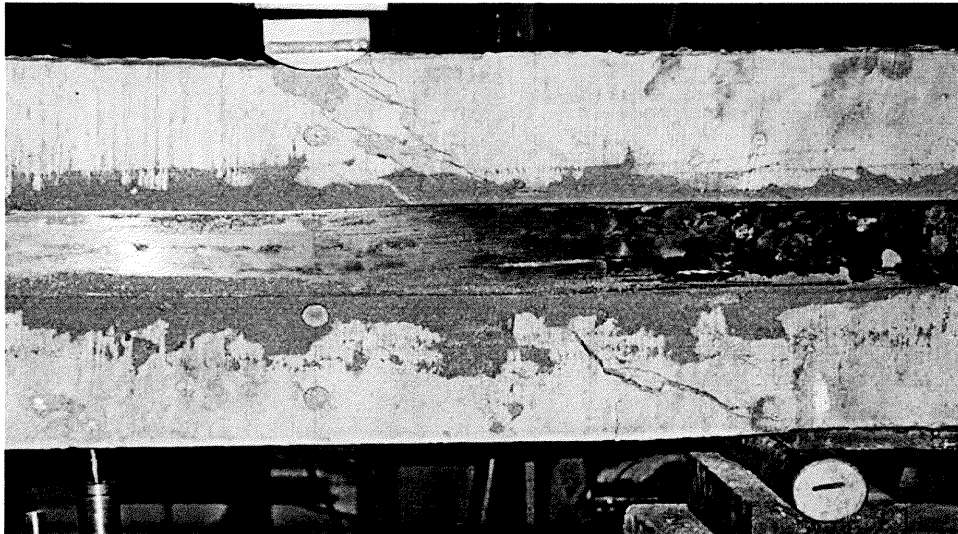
Failure of beam 2-2 with mid-strip CFRP location
